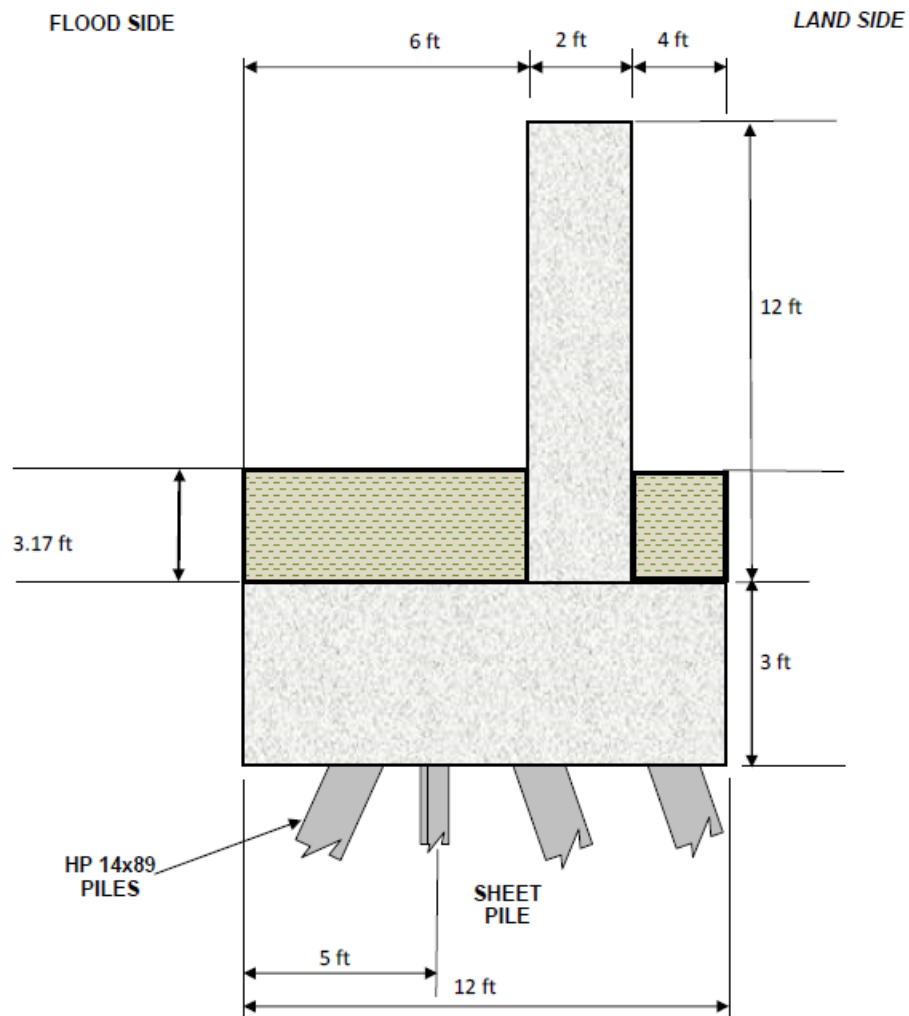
Representative Typical Existing T-Wall Cross Section
